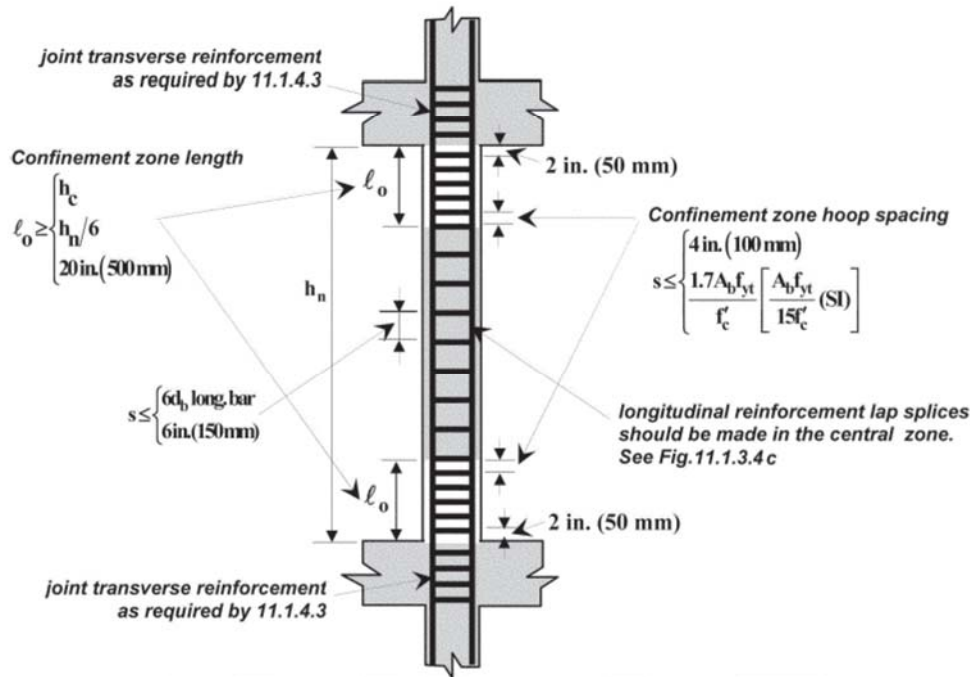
Confinement hoop spacing in columns.
